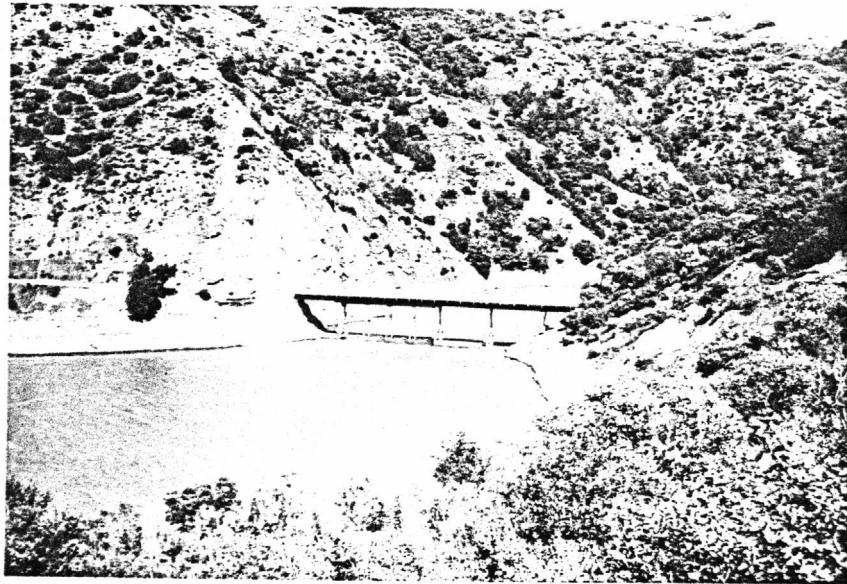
Cochrane Bridge over Anderson Reservoir. Bridge has been shortened by the telescoping of the timbers which support the pavement roadbed. Note the rockfall which covers East Dunne Avenue east of the Cochrane Bridge (near location (69)).
